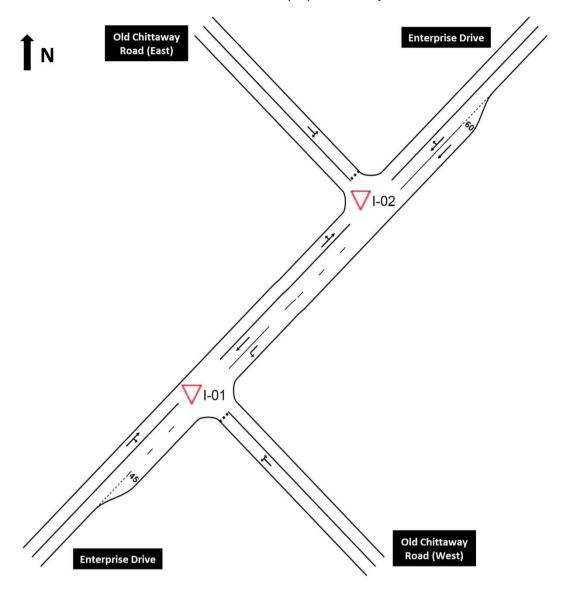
Existing intersection layout – Enterprise Drive, Old Chittaway Road (East) and Old Chittaway Road (West)
